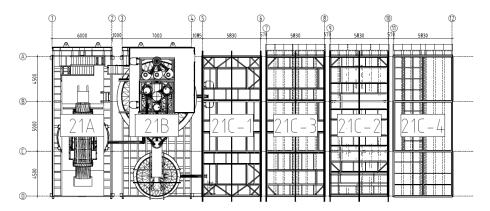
Primary Concentrator Plant Module Arrangement (21E Electrical not shown)
